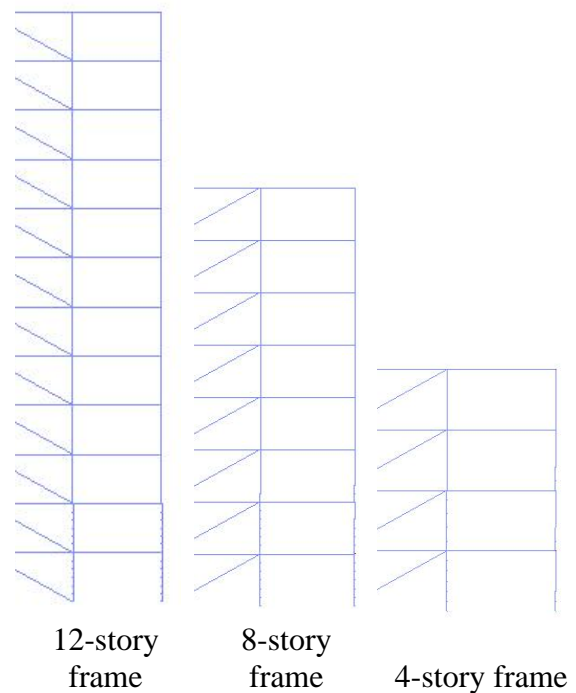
4-story, 8-story, and 12-story frames equipped with the pipe dampers
